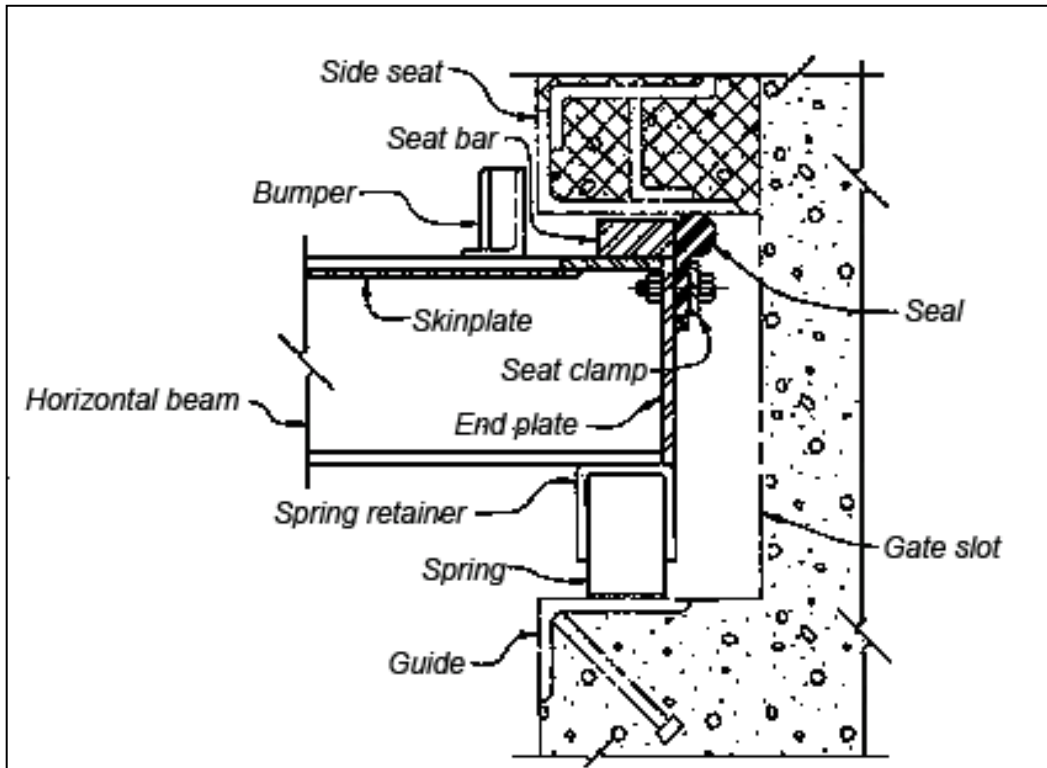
Section through bulkhead gate in slot.
